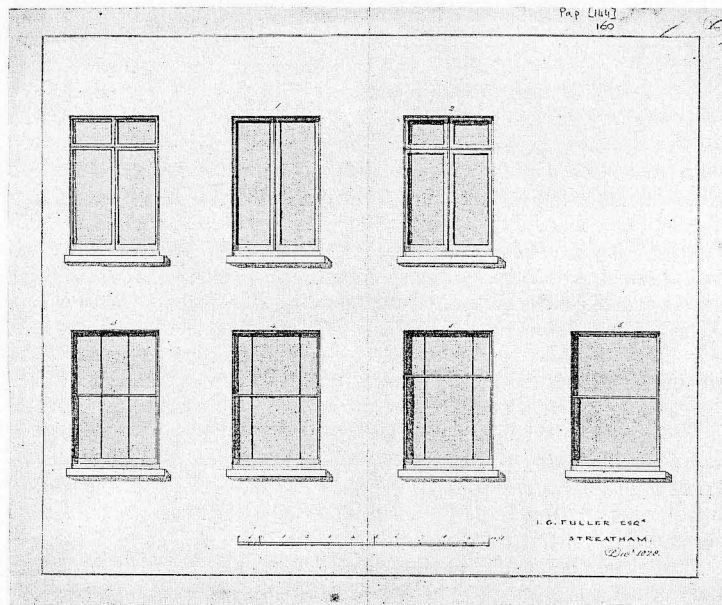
J B Papworth Drawing showing alternative arrangements for window glass in a house designed for J Fuller, Streatham, Surrey, dated 1828. (British Architecture Library, RIBA)
